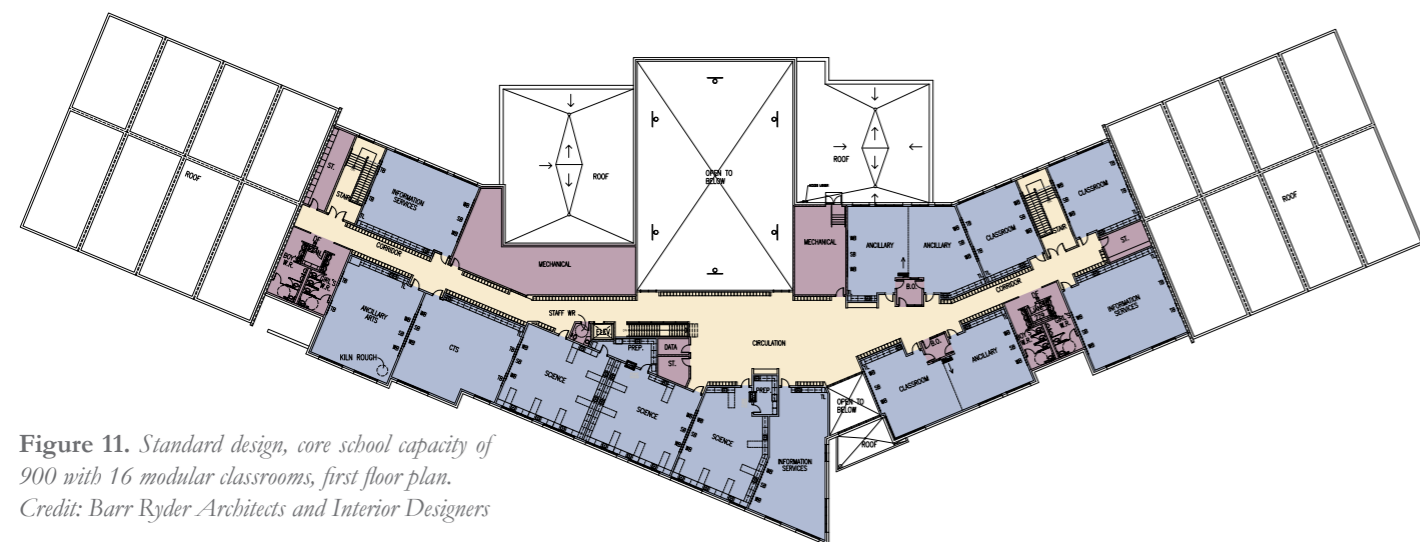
Standard design, core school capacity of 900 with 16 modular classrooms, first floor plan. Credit: Barr Ryder Architects and Interior Designers
